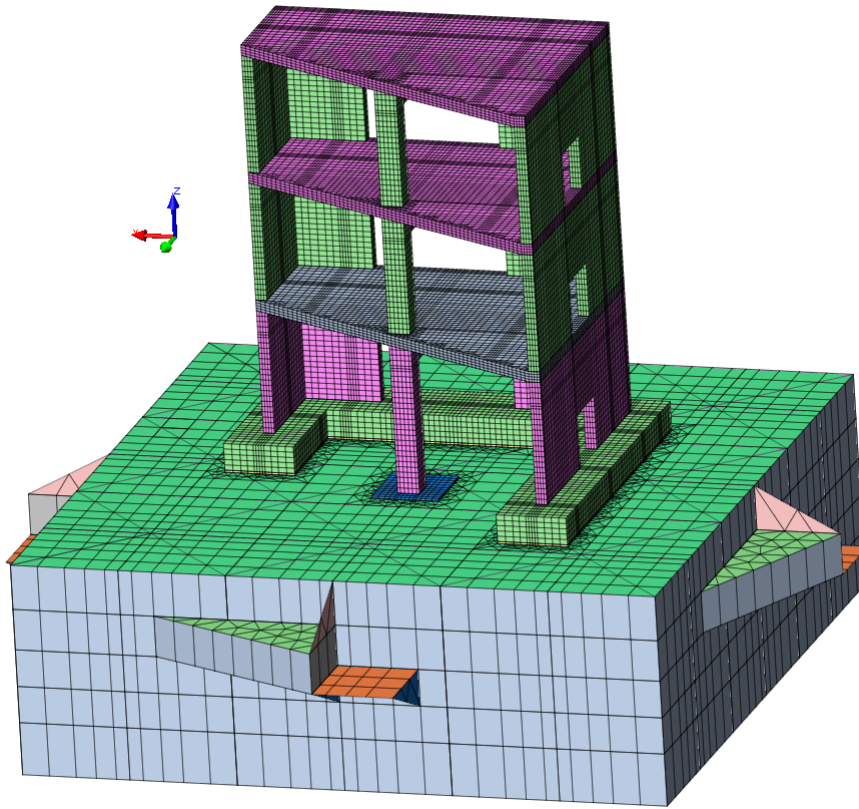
Reinforced concrete mock-up and the shaking table.
